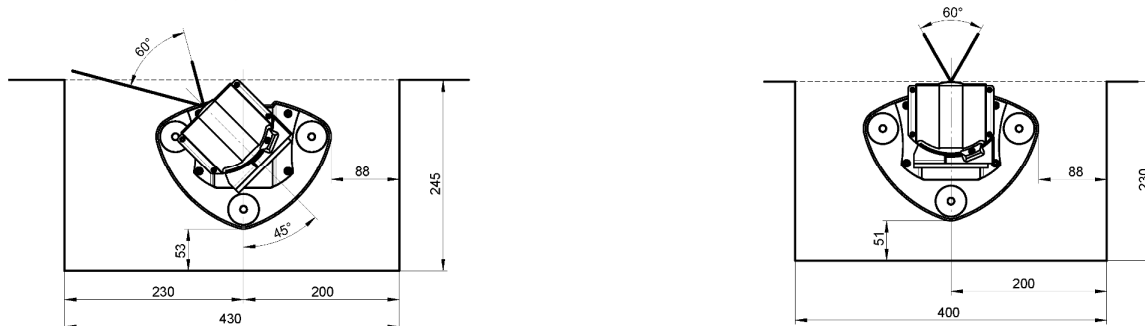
Width and depth of a wall niche - installation with a floor mount (dimensions in mm)
